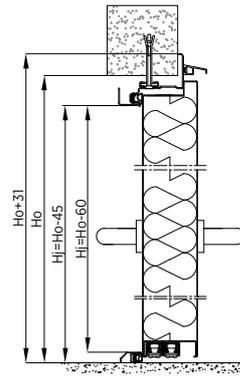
Installation of the single-leaf door to a masonry wall - corner frame with a thermal break - vertical cross-section
